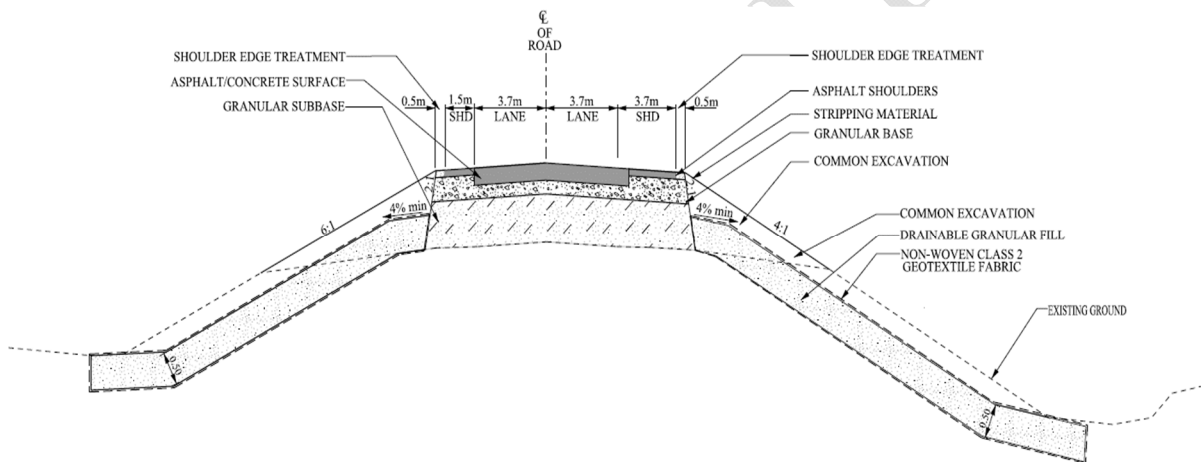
Typical x-Section and Subsurface Sand Drain (Embankment Drain) Installed in the Embankment of Flood Prone Highway/Road Section
